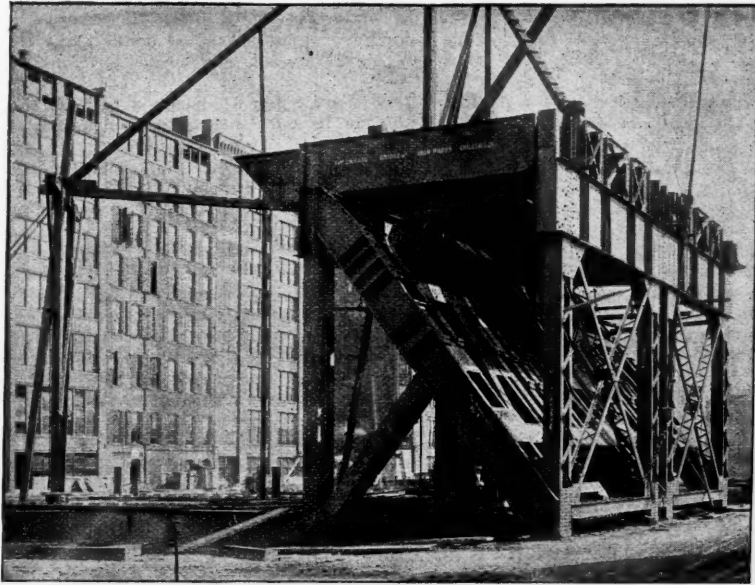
West Pier, Four Track Bridge, West Side Metropolitan Elevated, Short Span adjoining.
